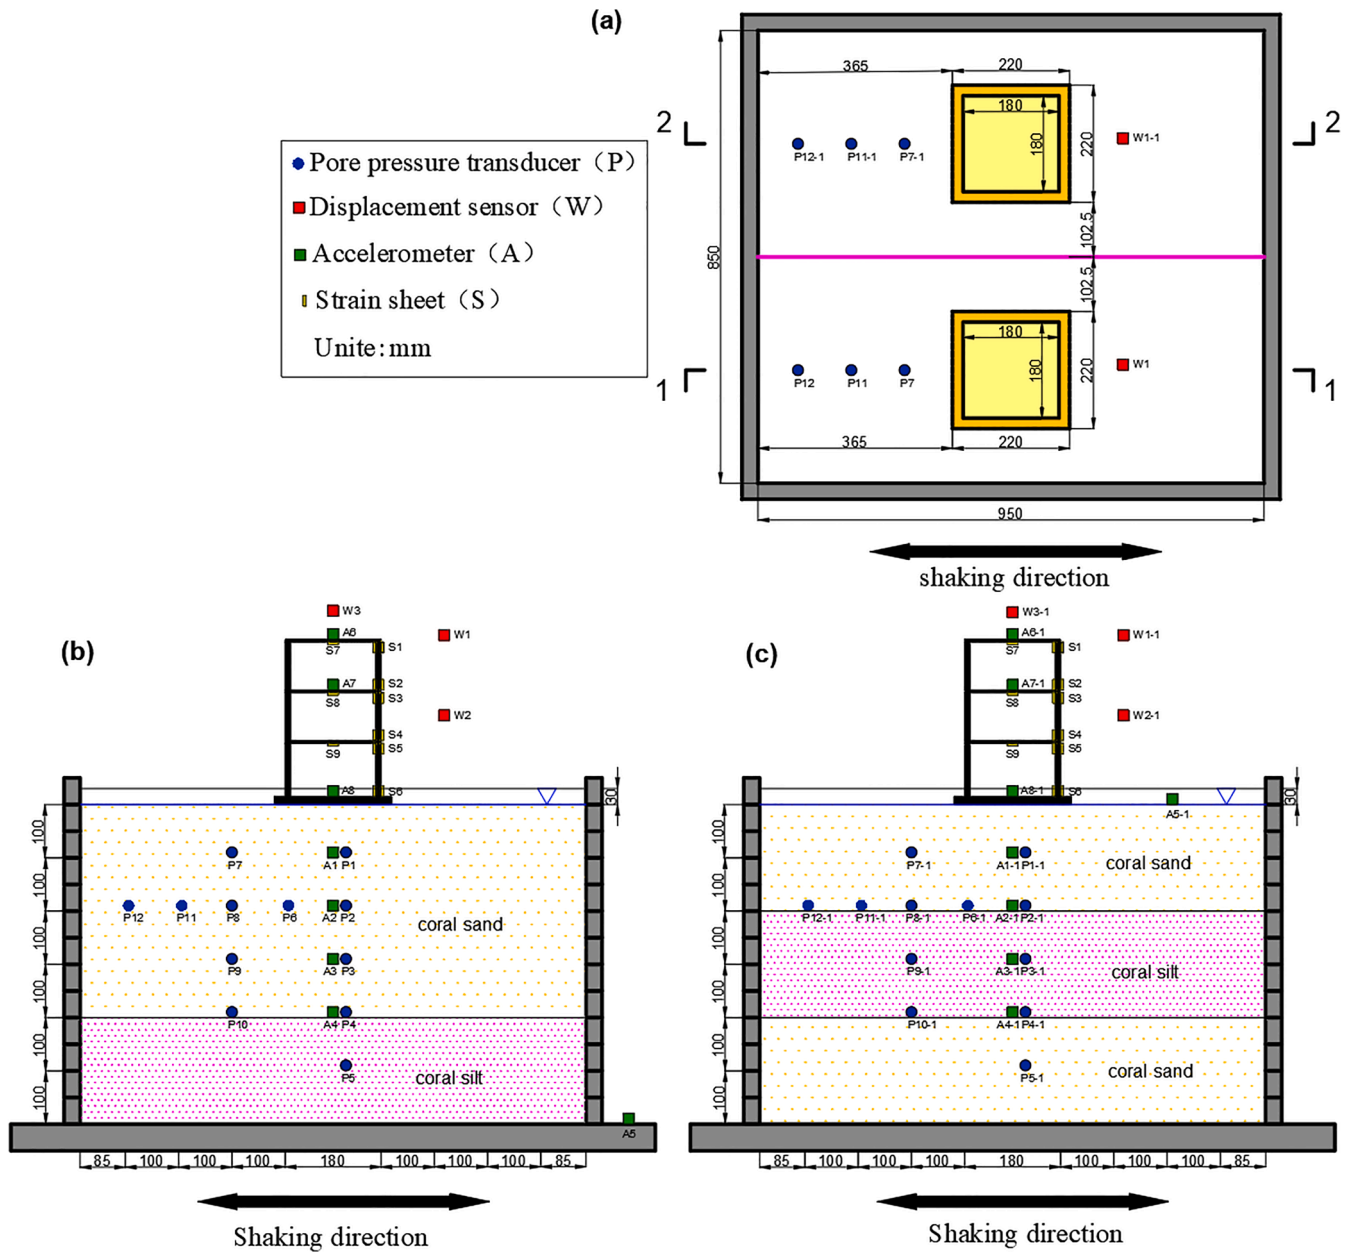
Model soil profile and instrumentation plan: (a) plan layout diagram; (b) elevation view along section 1-1 and (c) elevation view along section 2-2.
